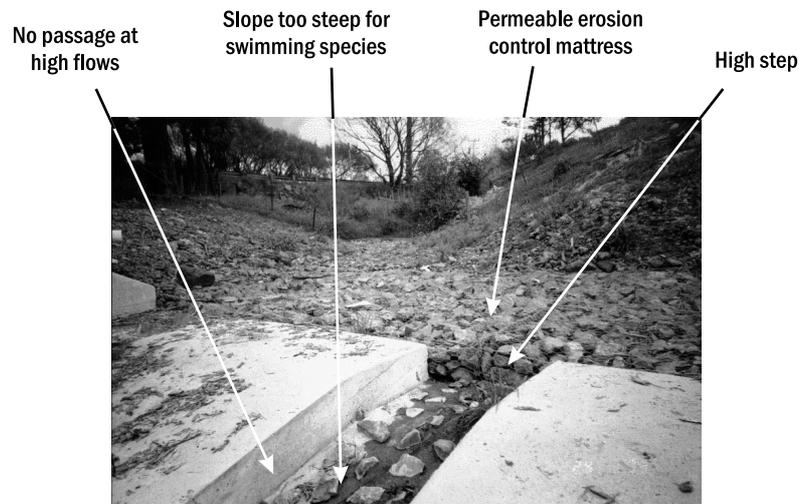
Steep bedslope modification at entry of culvert on an unnamed tributary of Weiti Stream.
